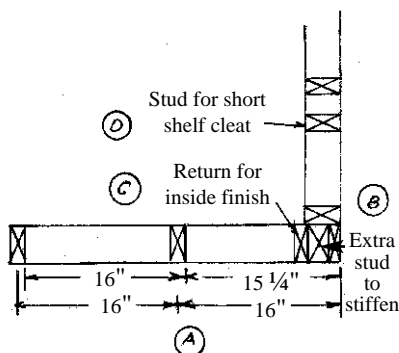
The placing of an extra stud at the outside corner of the wall to help stiffen it
